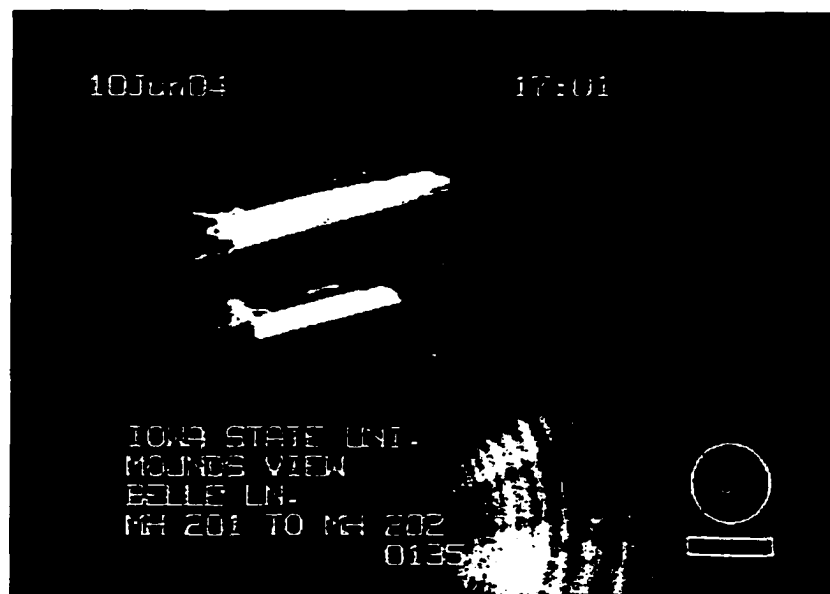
Two rods penetrating the pipe wall at 133 feet from MH 201.
